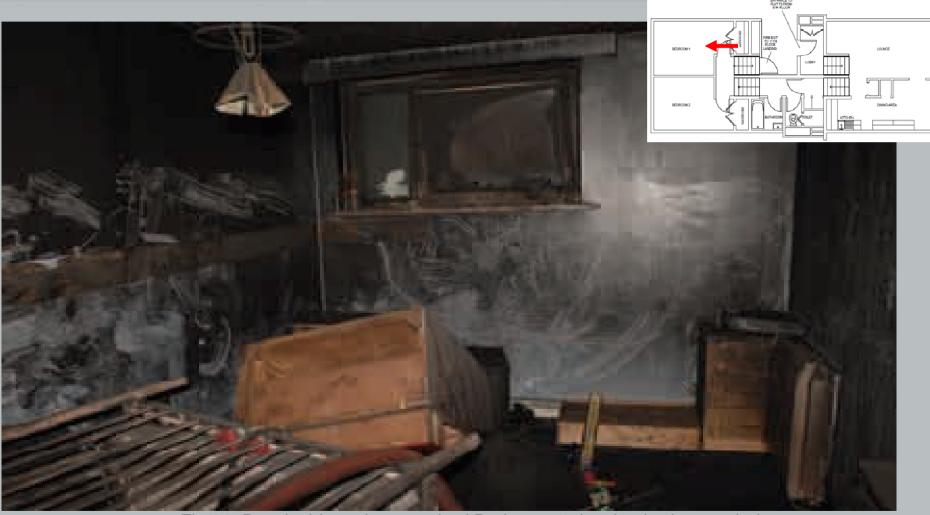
Post incident photograph of Bedroom 1 showing bedroom window (Source: Hampshire Constabulary)
